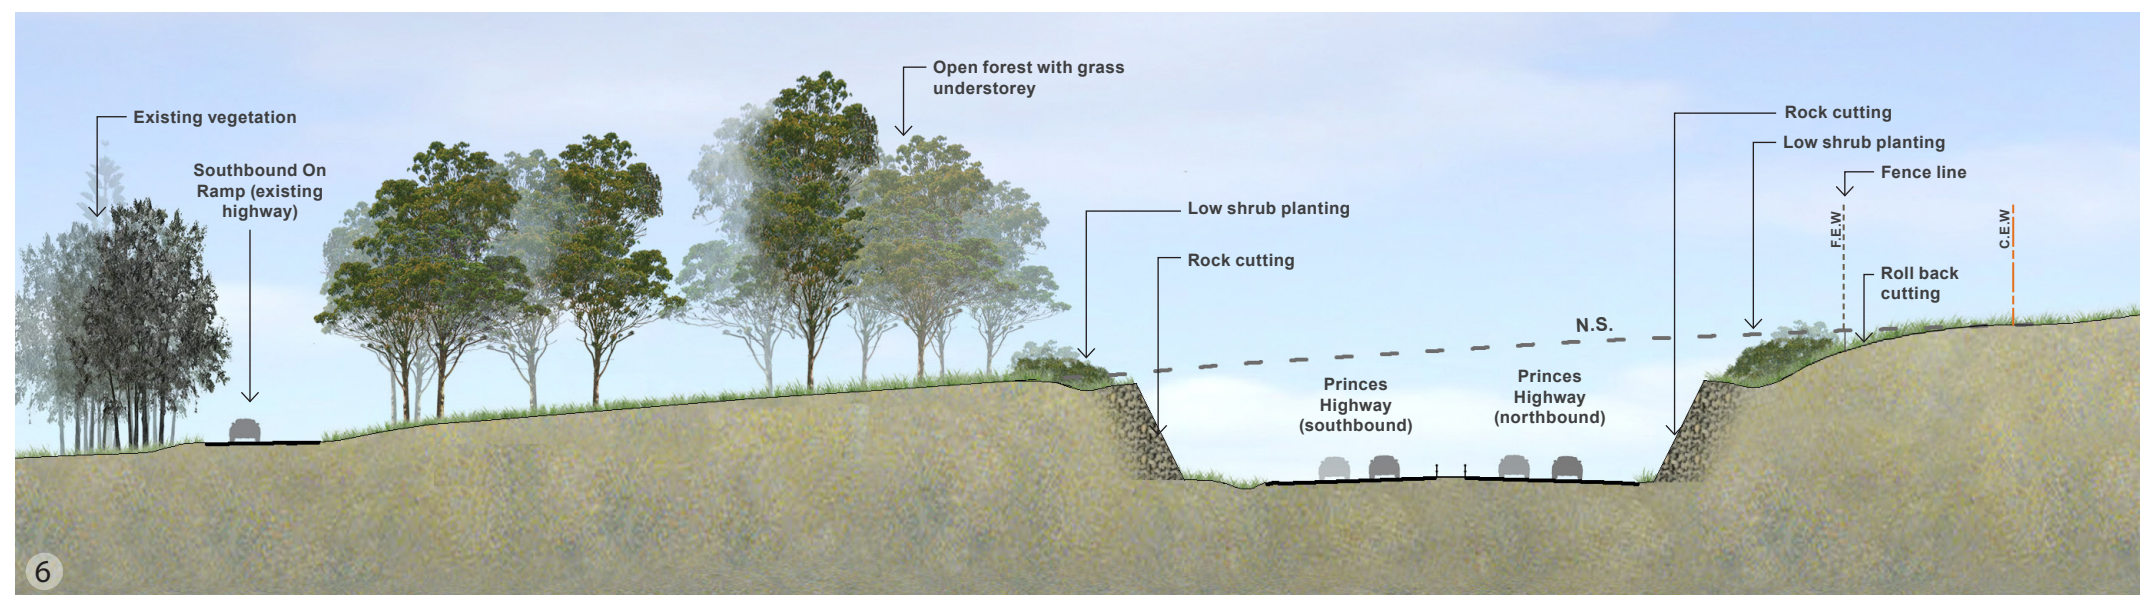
Elevation / Section 6 - Broughton Creek - Chainage 12500
